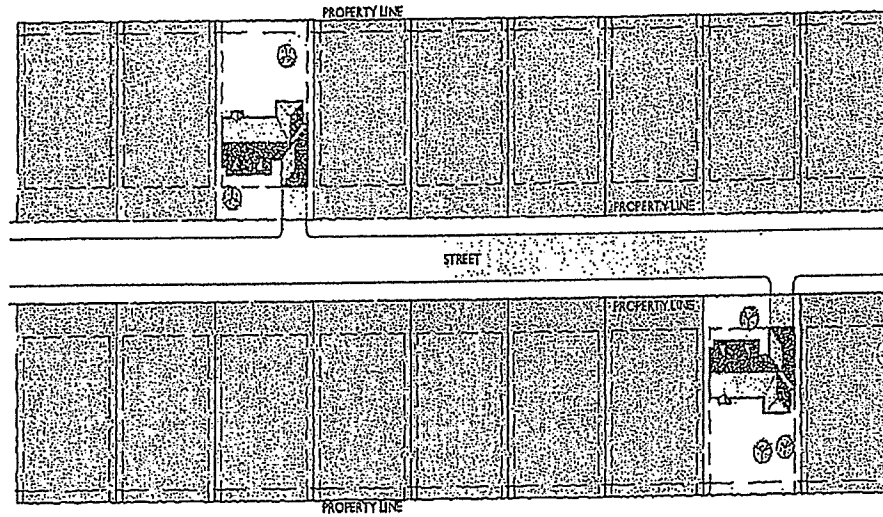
Same Plan, Same Elevation, Different/Same Side of Street: if homes share the same plan and elevation, four full lots must separate similar elevations. In addition, similar elevations are not allowed to face opposite one another.
